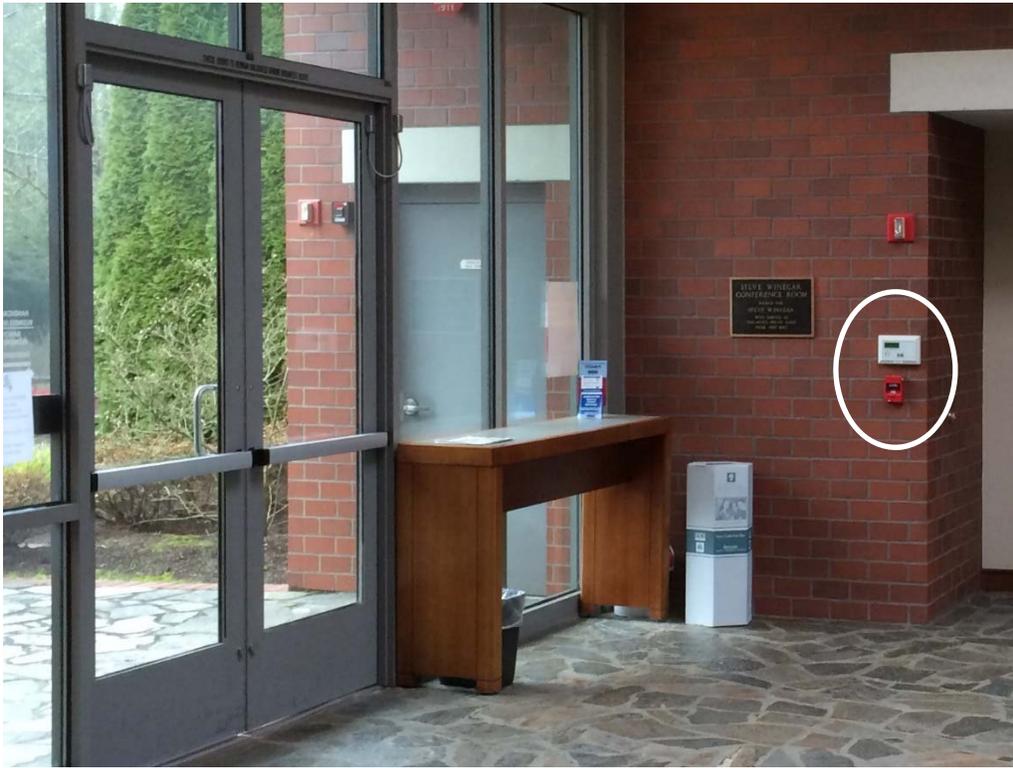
Fire alarm pull station and system panel adjacent to entry door
